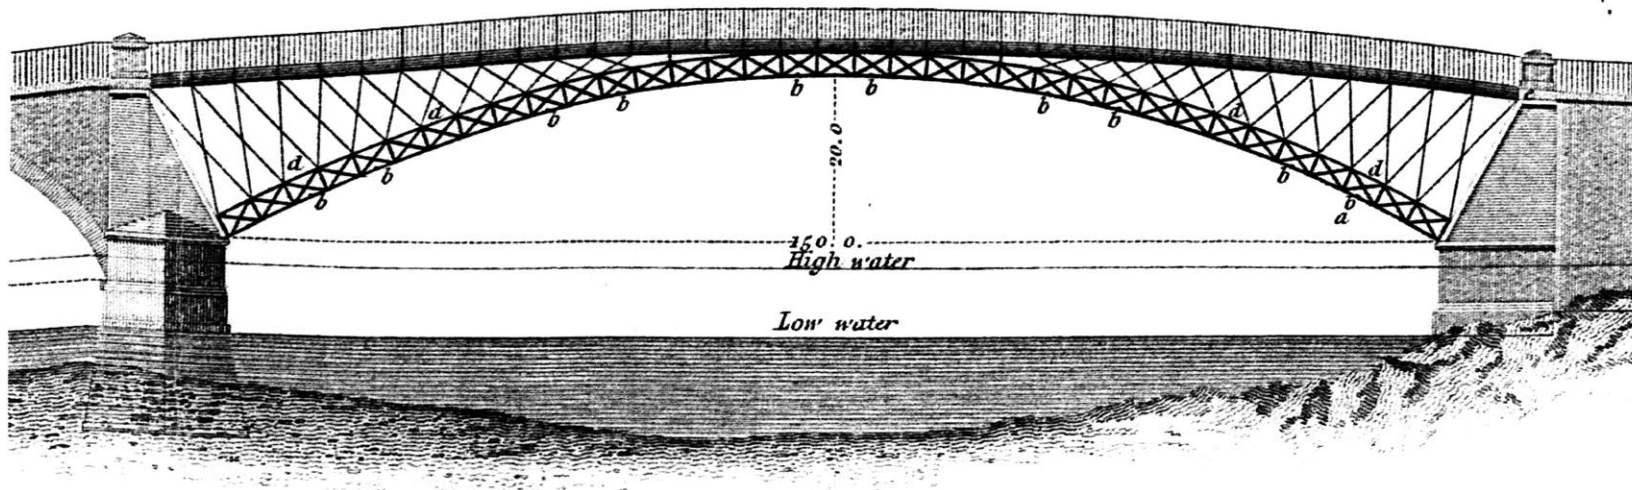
Close-up, elevation, Bonar Bridge (*Sixth Report of the Commissioners for Highland Roads and Bridges 1813*)
